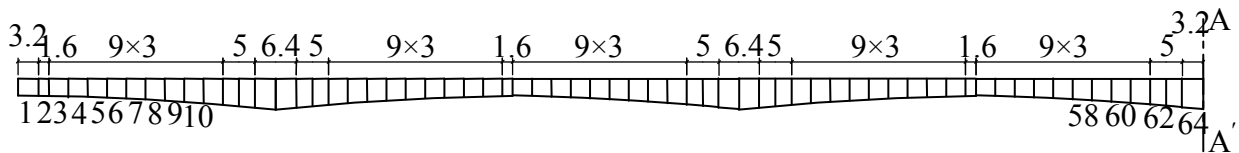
The mode of 40 m+4×72 m+40 m party pre-stressed concrete box-girder bridge
